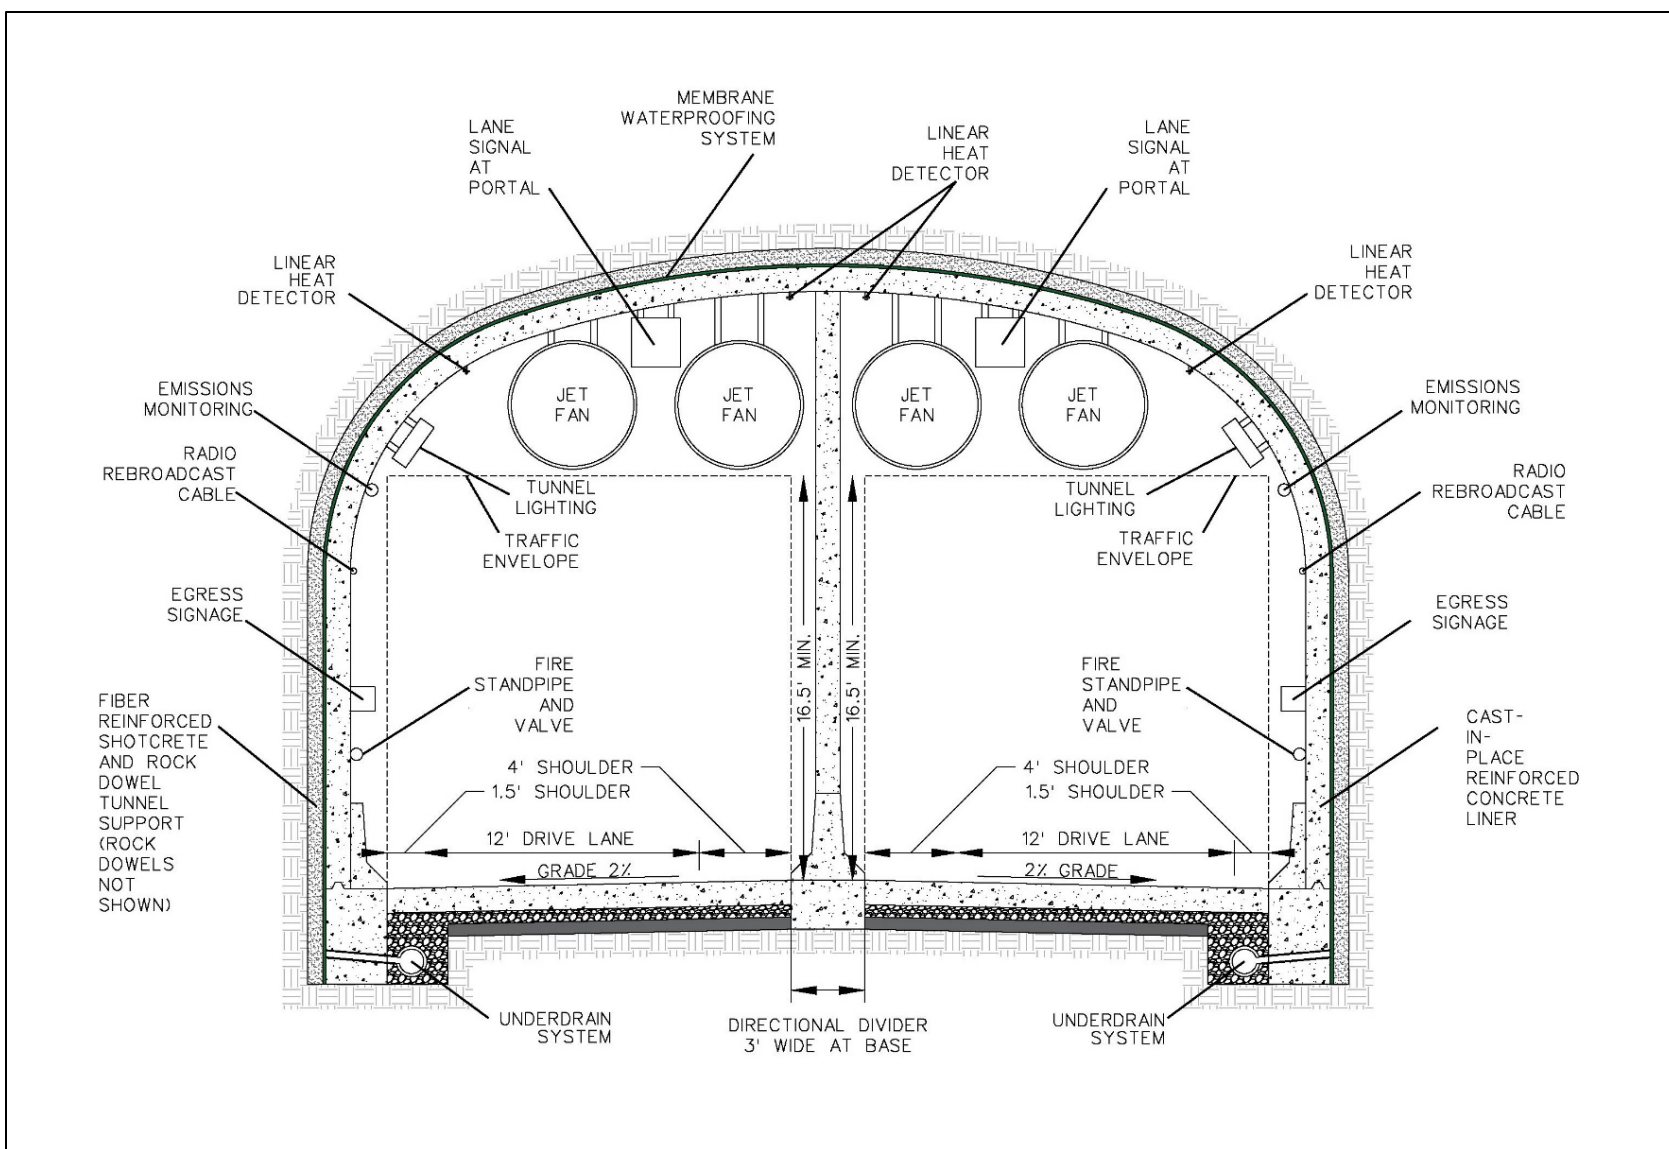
CONCEPTUAL DESIGN OF CROOKED ARM RIDGE TUNNEL
